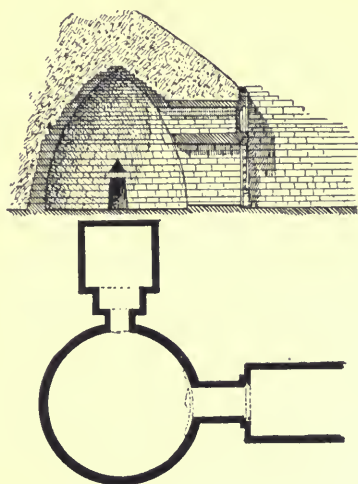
THOLOS OF ATREUS. PLAN AND SECTION.
